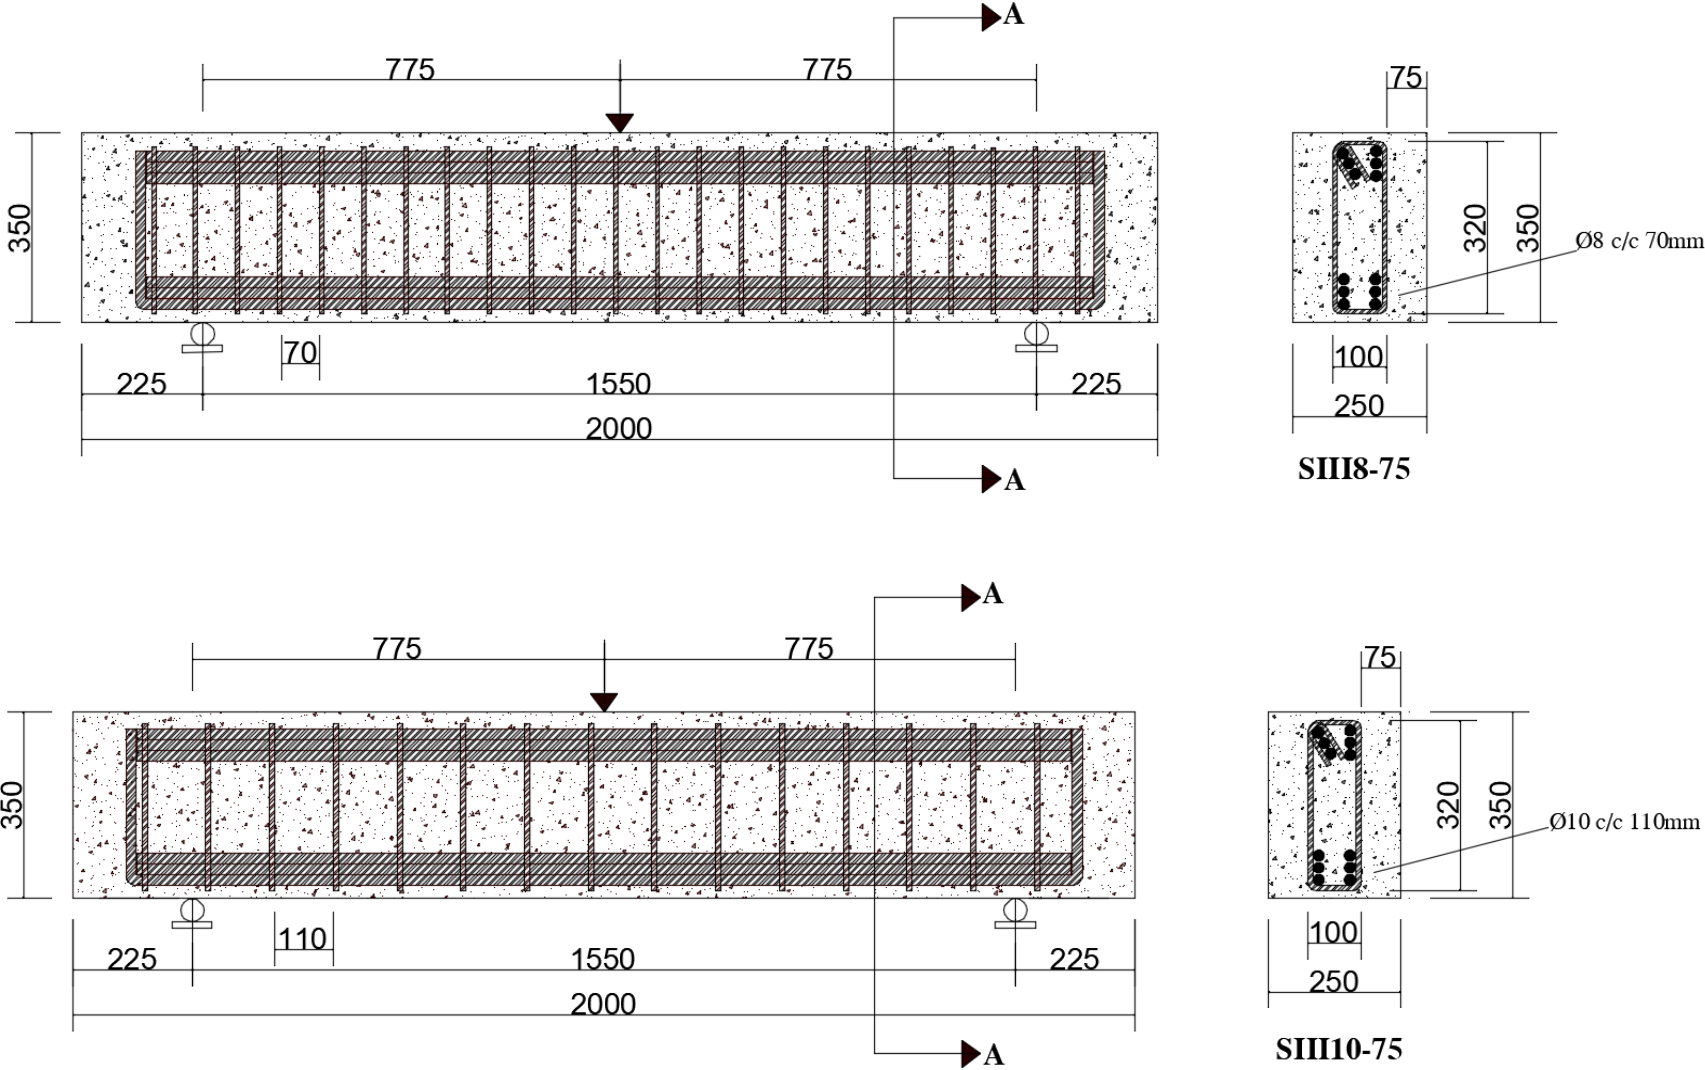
Cross Sectional Detail of Main Specimens SET III (All Dimension are in mm)
